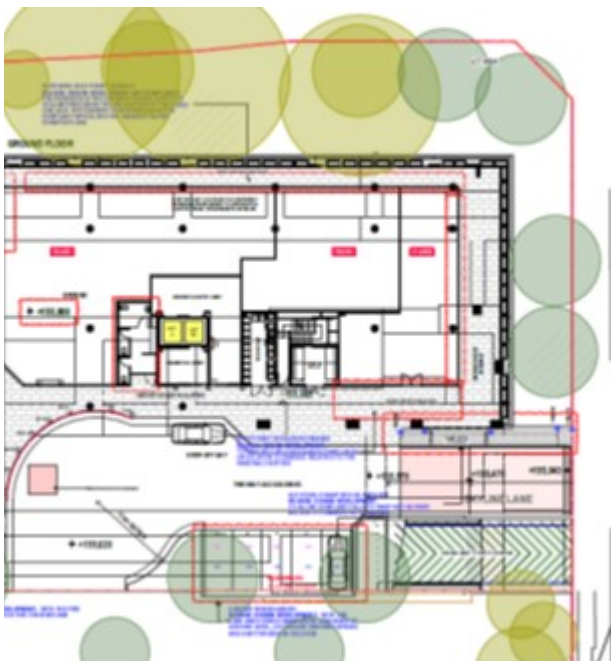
Mod Plan indicating increased parking and deletion of approved landscaping.
